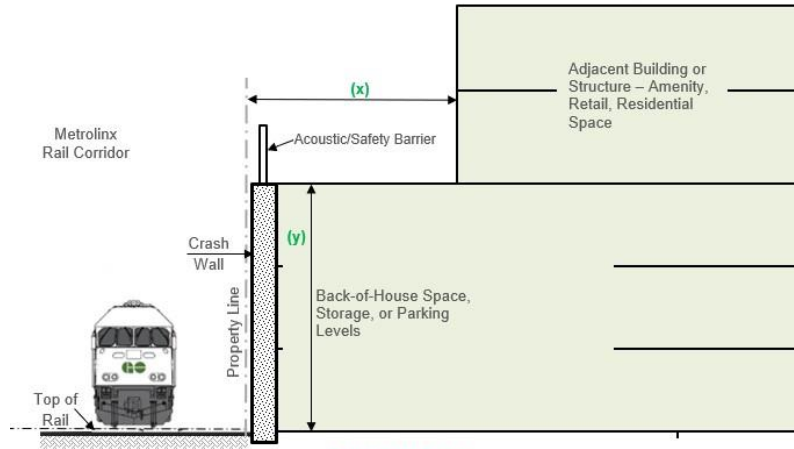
Horizontal/Vertical Setback with Crash Wall
